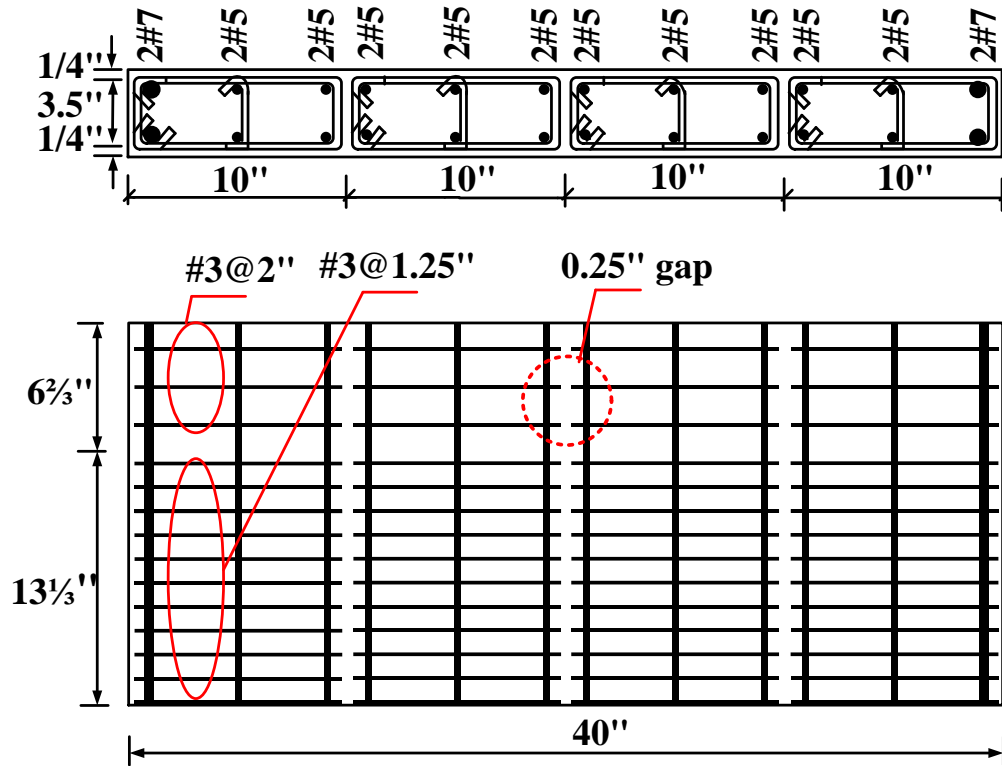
Reinforcement layout for specimen SW-HP-0.5-2
